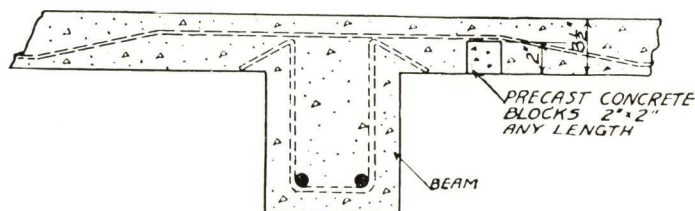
, Showing Inexpensive Method of Supporting Wire Fabric Reinforcement Over Concrete Beams
